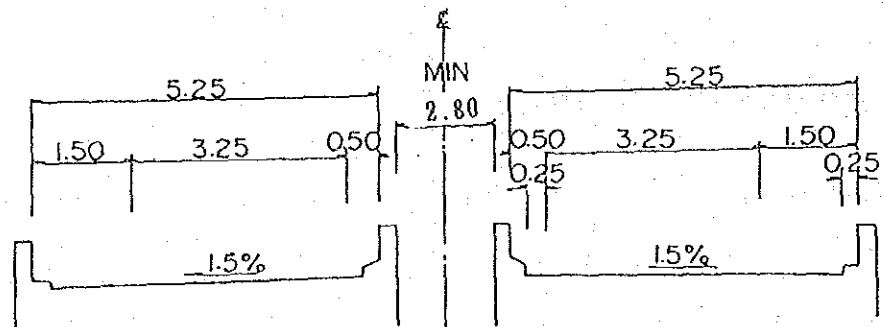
Typical Cross Section for 2 Lanes Two Ways, Viaduct
